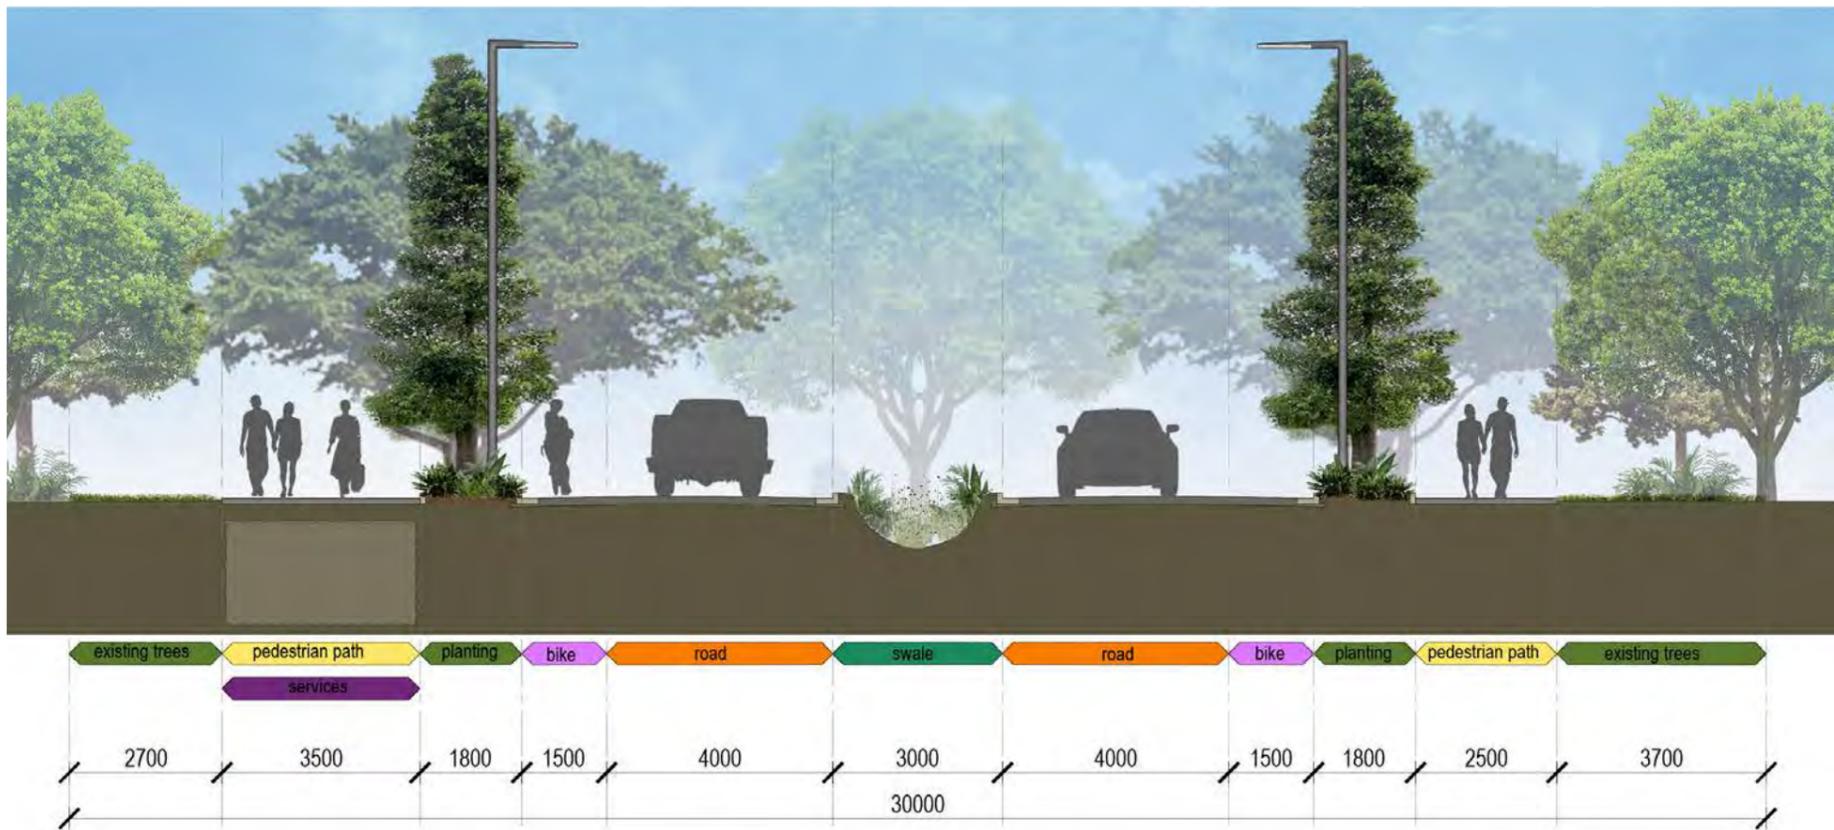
PRIMARY ACCESS ROAD SECTION 1:125
